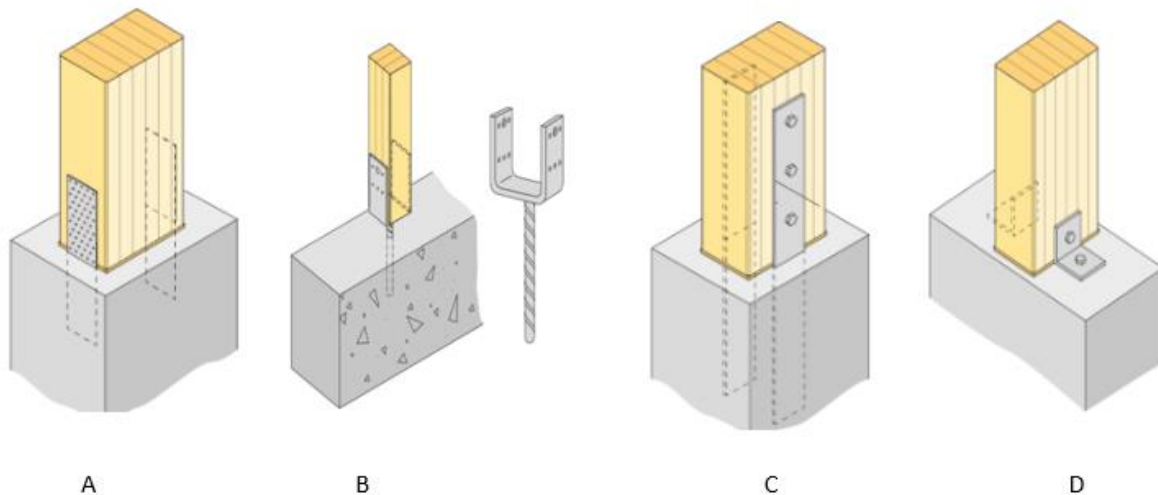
Fitting of column foot to foundation by some joint-bearing (Group)
